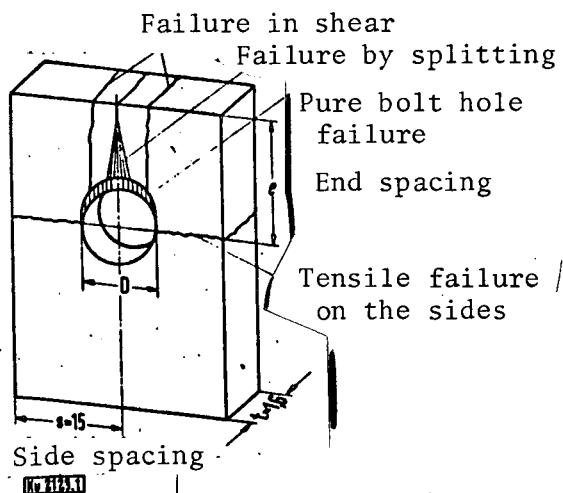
Forms of Failure of Bolted Joints. Dimensions in mm.
